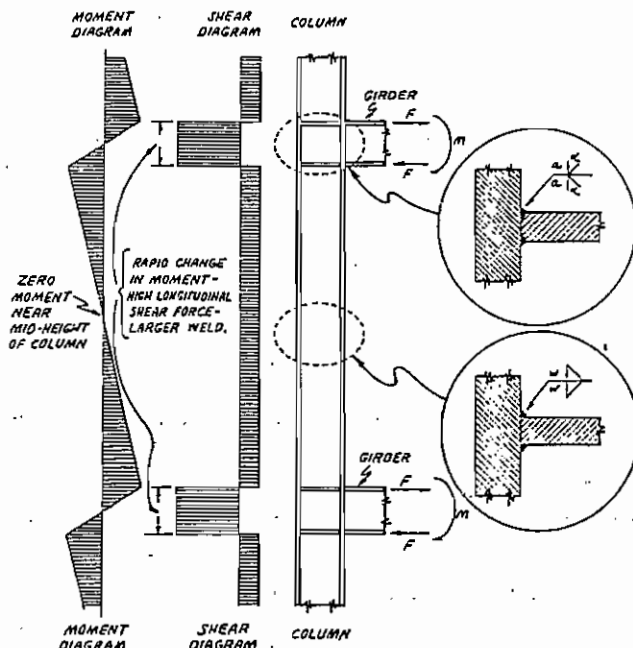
Shear diagram of frame indicates where the amount of welding is critical.
